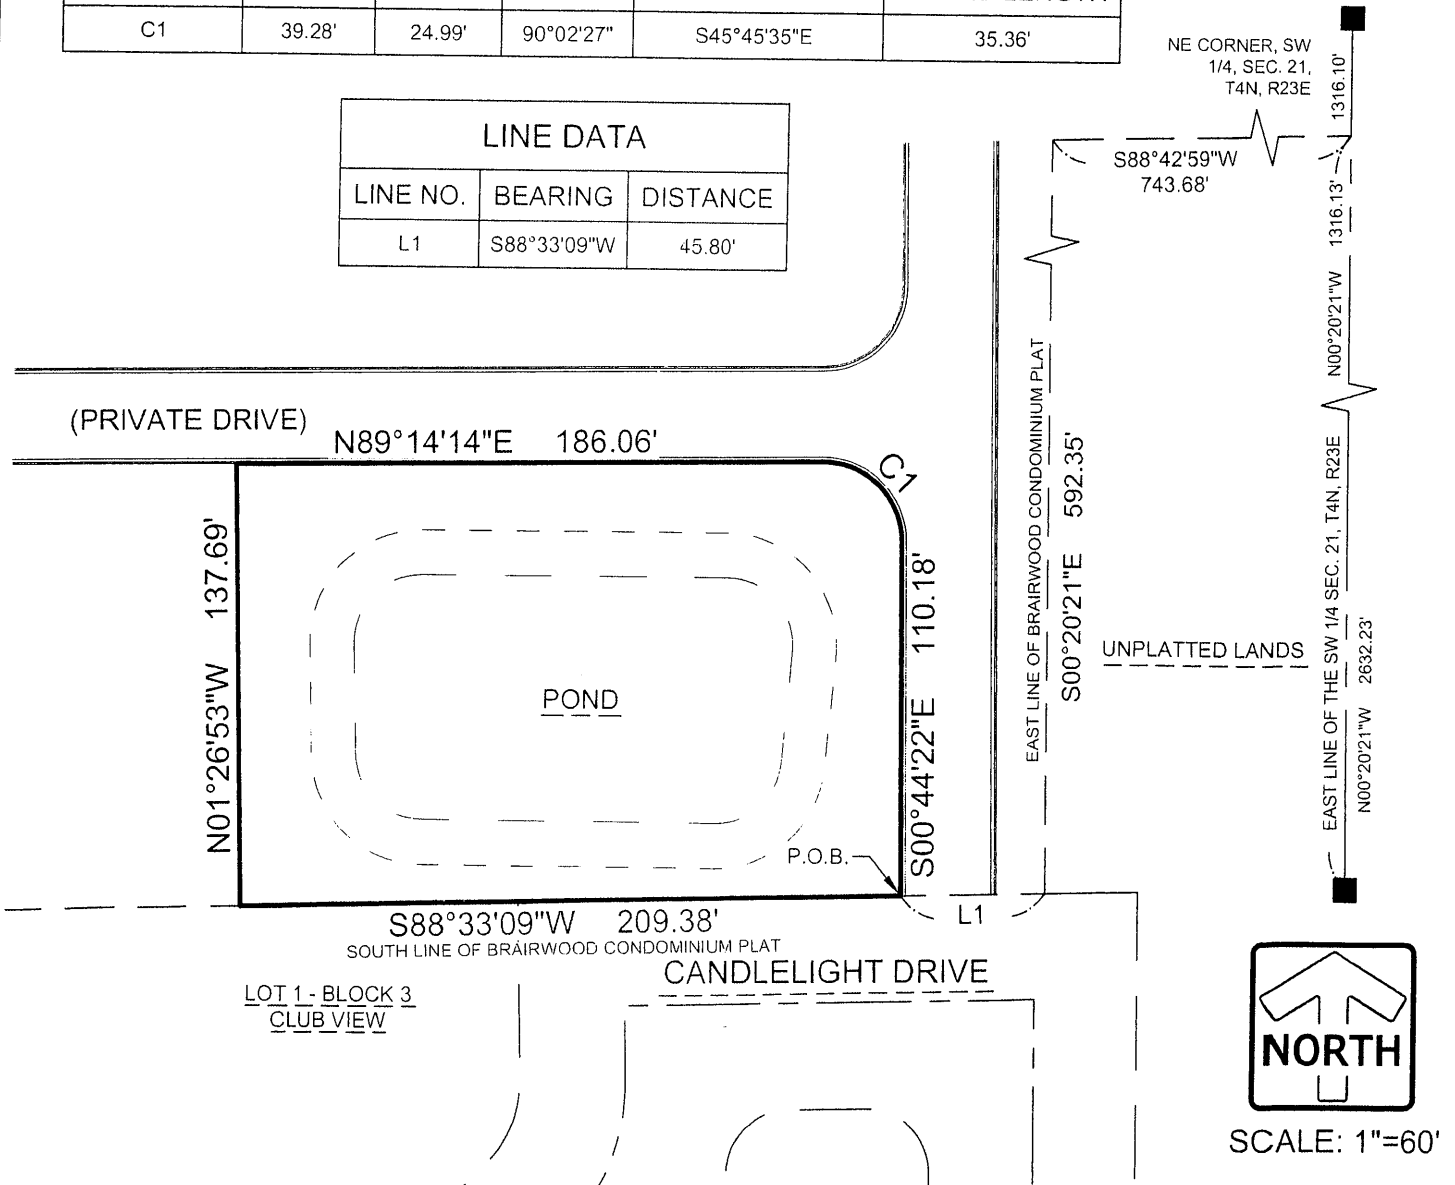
Exhibit C -- Wet Pond Overall Drainage & Grading Plan
